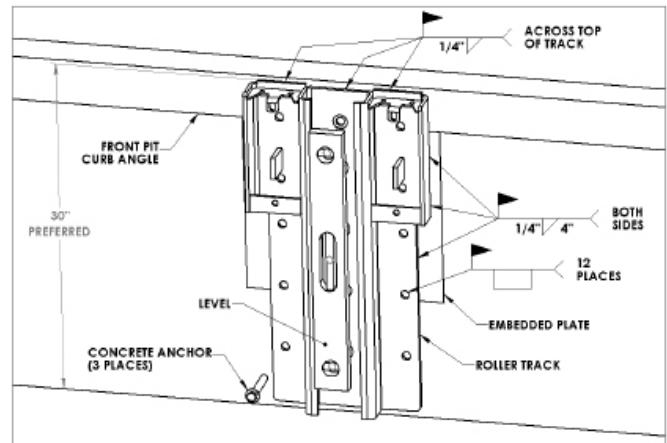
WELDING ROLLER TRACK FRONT VIEW
